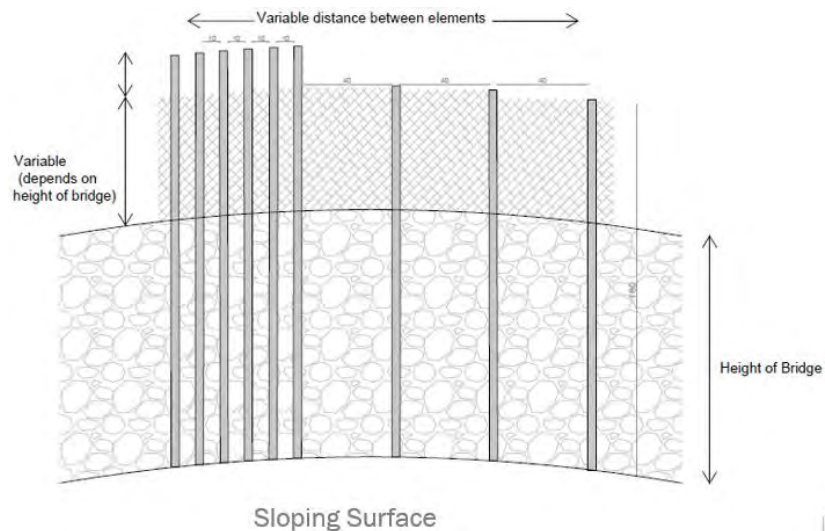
Design intent for parapet heightening on bridges - Sloping Surface
